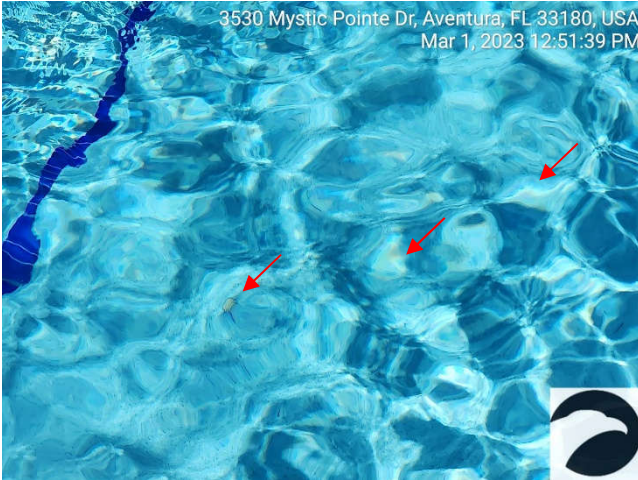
Deteriorated finish surface at pool (Pool Deck Level)
